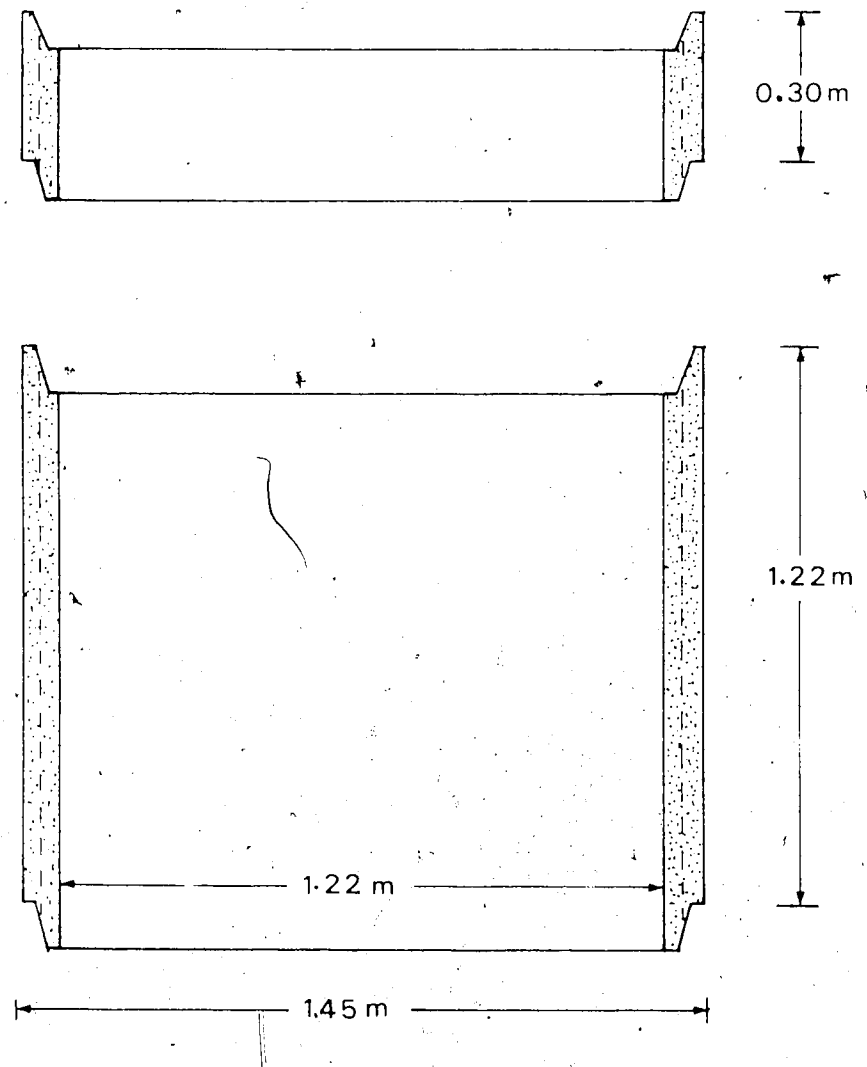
Vertical sections of the two barrels which formed a concrete bin.
